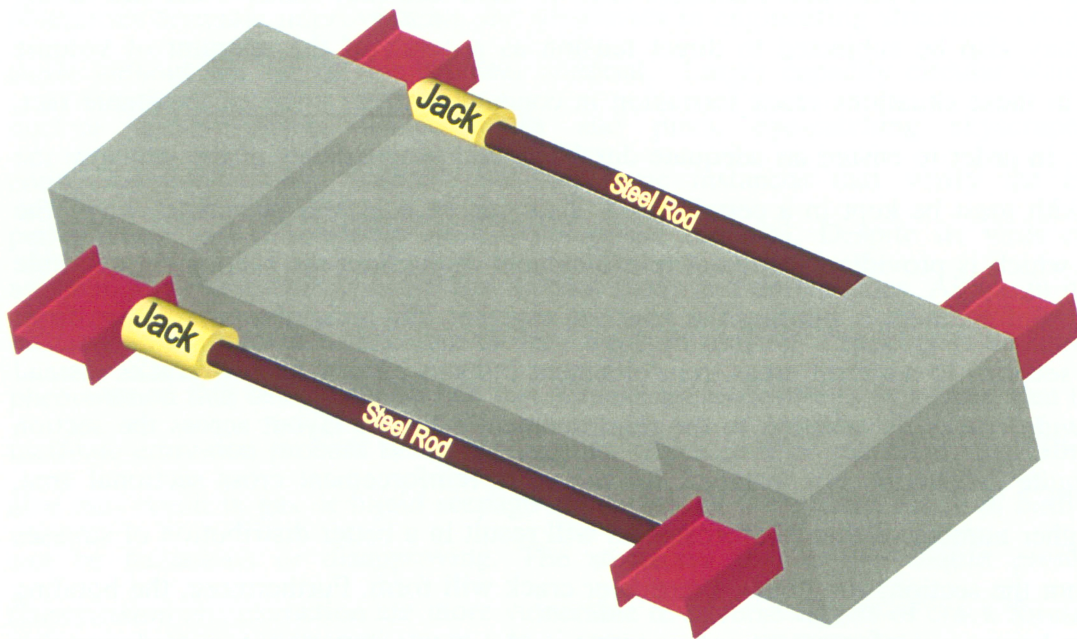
Direct tension specimen and hydraulic jacks configuration
